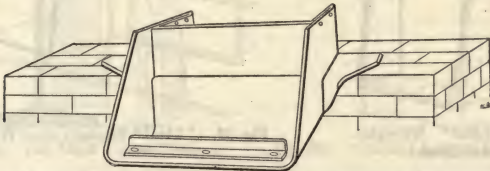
Duplex Extra-heavy Wall-hanger for Mill-construction
